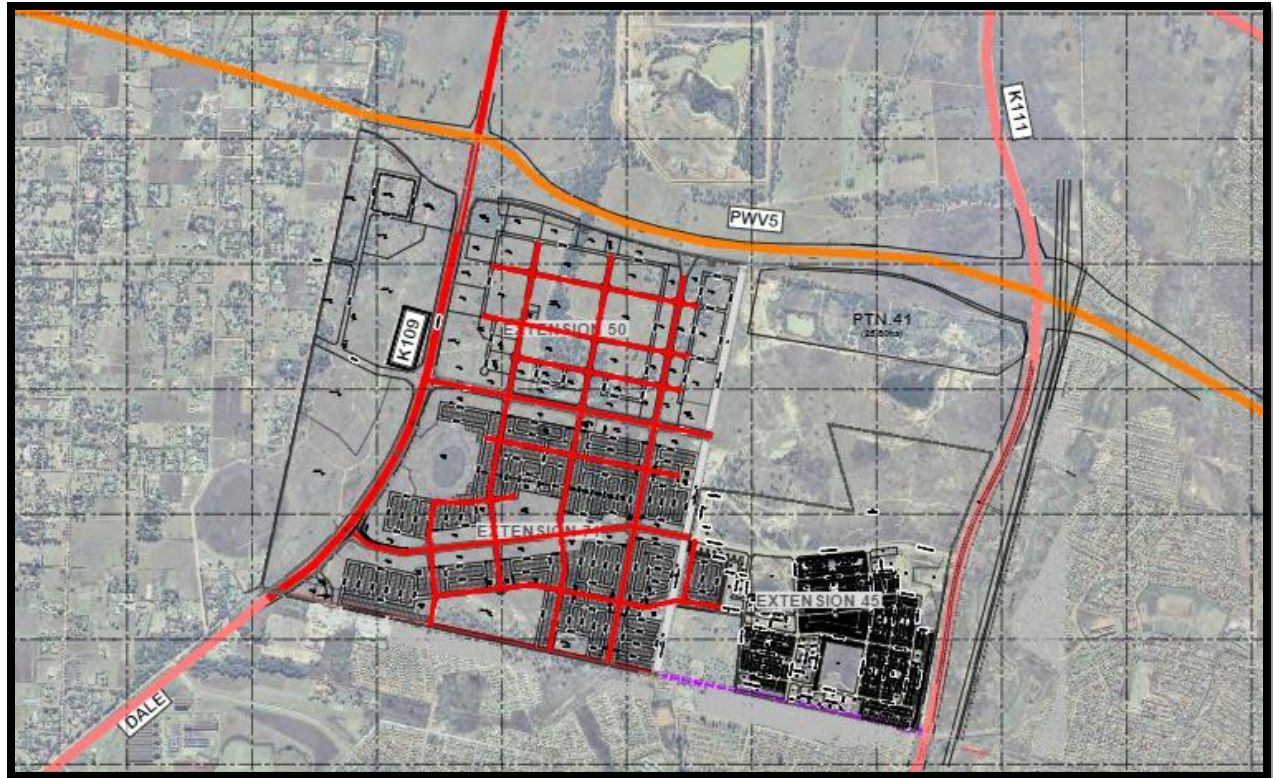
Proposed Bulk Roads and Stormwater Infrastructure
